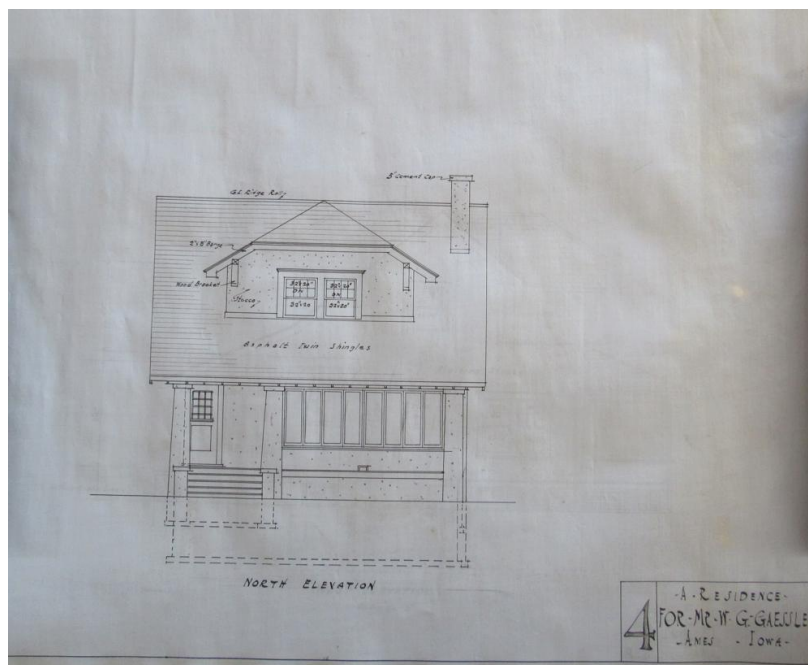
1212 Park Way, Ames, Iowa, Front Elevation. Print courtesy of David R. Russell.
